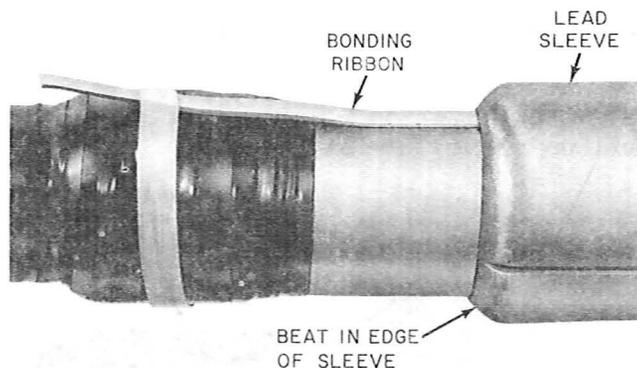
Auxiliary Sleeve Cut Back 2 Inches
